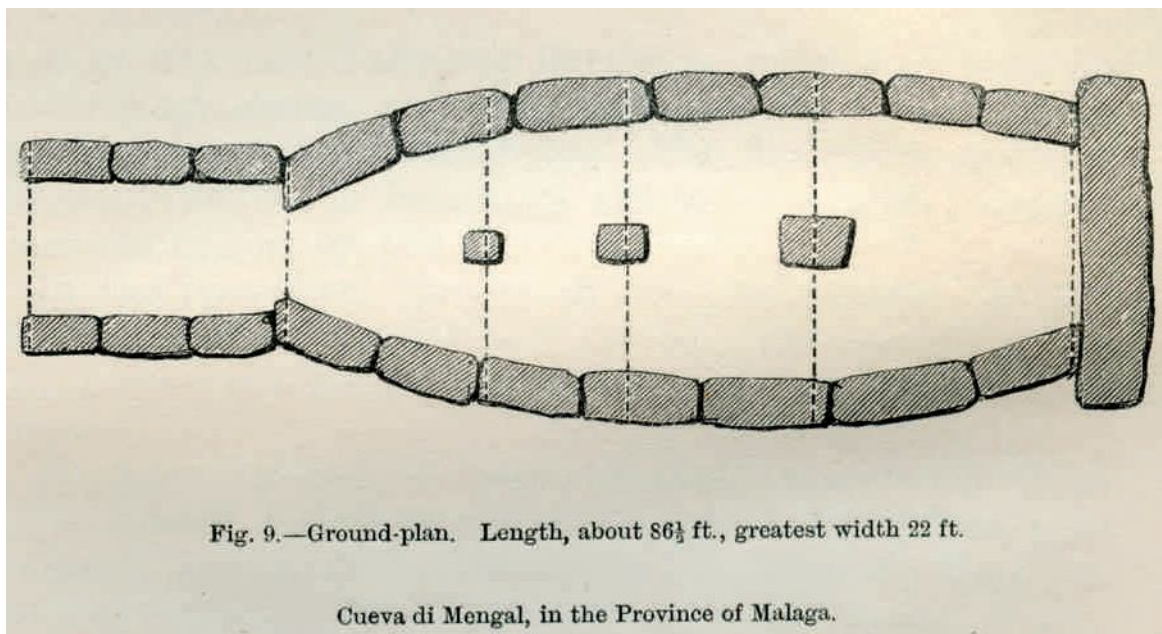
Ground-plan. Length, about 86½ ft., greatest width 22 ft.
